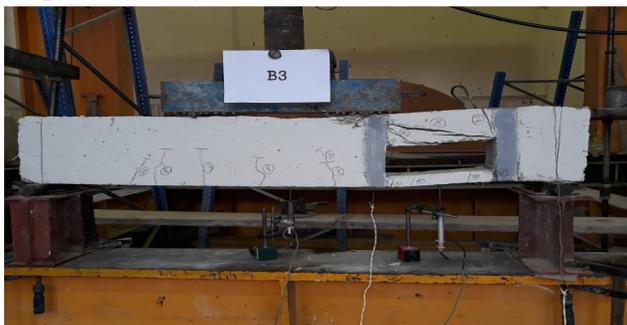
Crack Patterns of Beam(B3) with GFRP Strengthening, U-Scheme.
